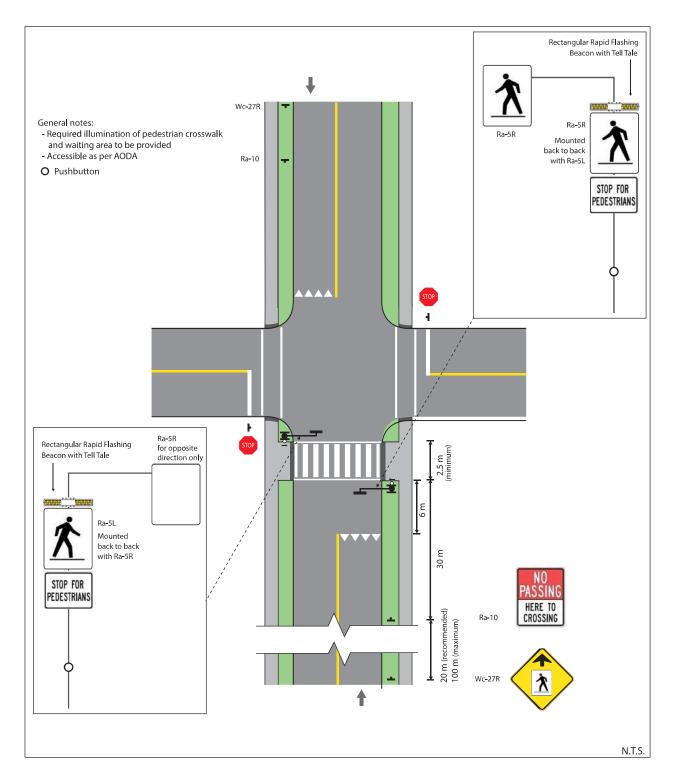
Pedestrian Crossover Level 2 Type B – Intersection (2-way)
